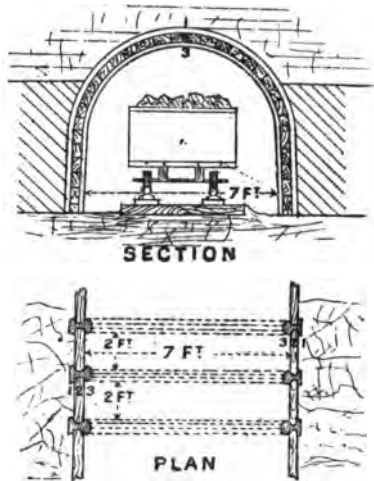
Method of supporting a roadway. 1, foot of rail; 2, timbering between rails; 3, head of rail.
